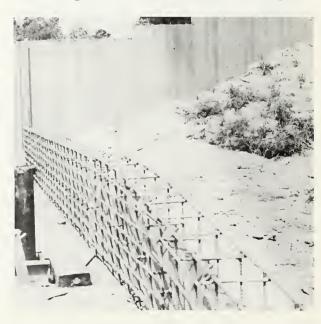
Weir-crest reinforcing-steel arrangement.
